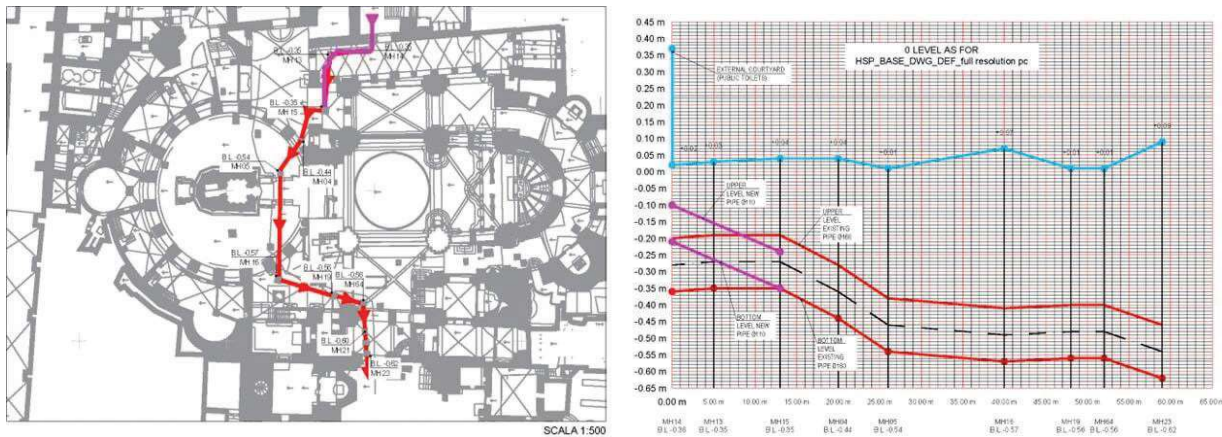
Drainage pipeline path and elevation profile of a drainage path (blue: floor levels; red: existing pipe; magenta: new pipe, with enhanced slope in the first part (left)).
